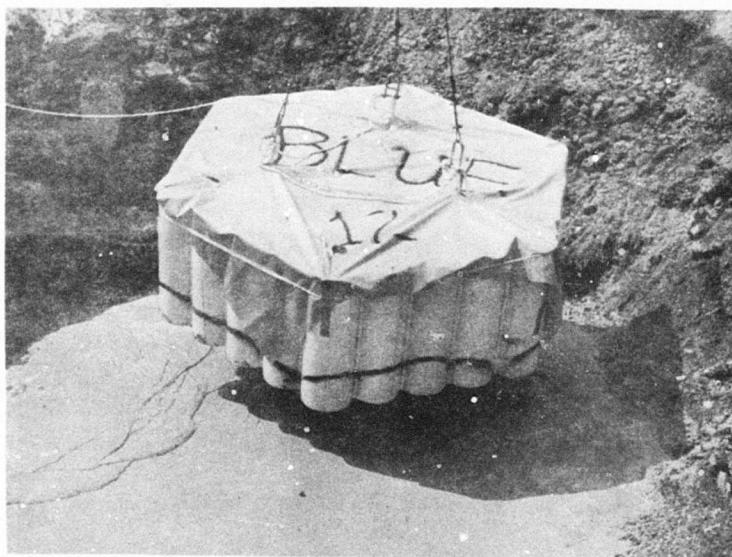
Test 2-1, Reg-set Slurry Floor Added for Strength
